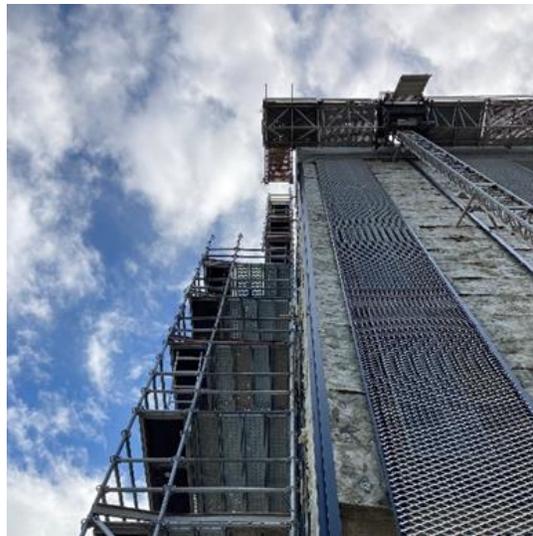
Detail of the panel installed on the supporting wall. © URSA Ibérica Aislantes S.A.
